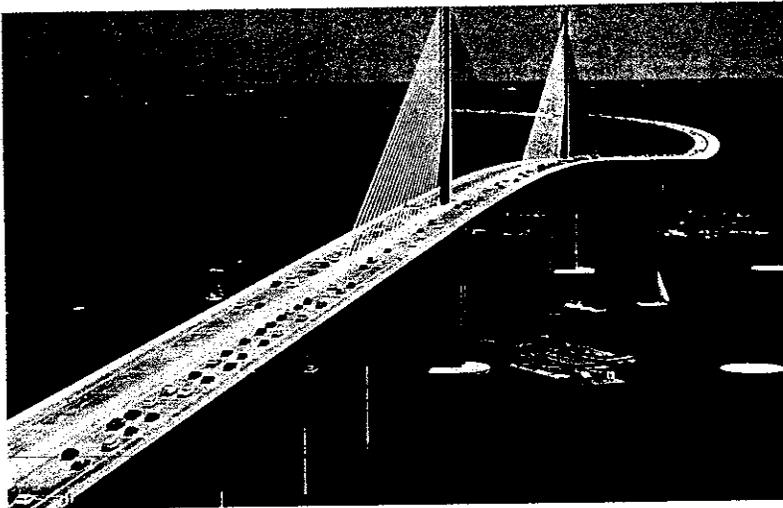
Fly ash concrete improved both the fresh and hardened concrete properties in the decks and piers of Tampa Bay's Sunshine Skyway Bridge.
